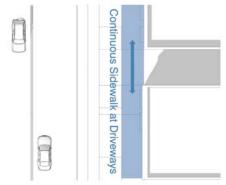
Sidewalks shall be continuous and uninterrupted at driveways.
